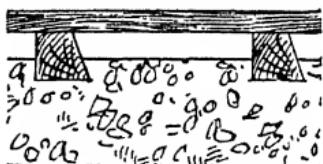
Boarded Concrete Floor with Dove-Tailed Wood Fillets.
